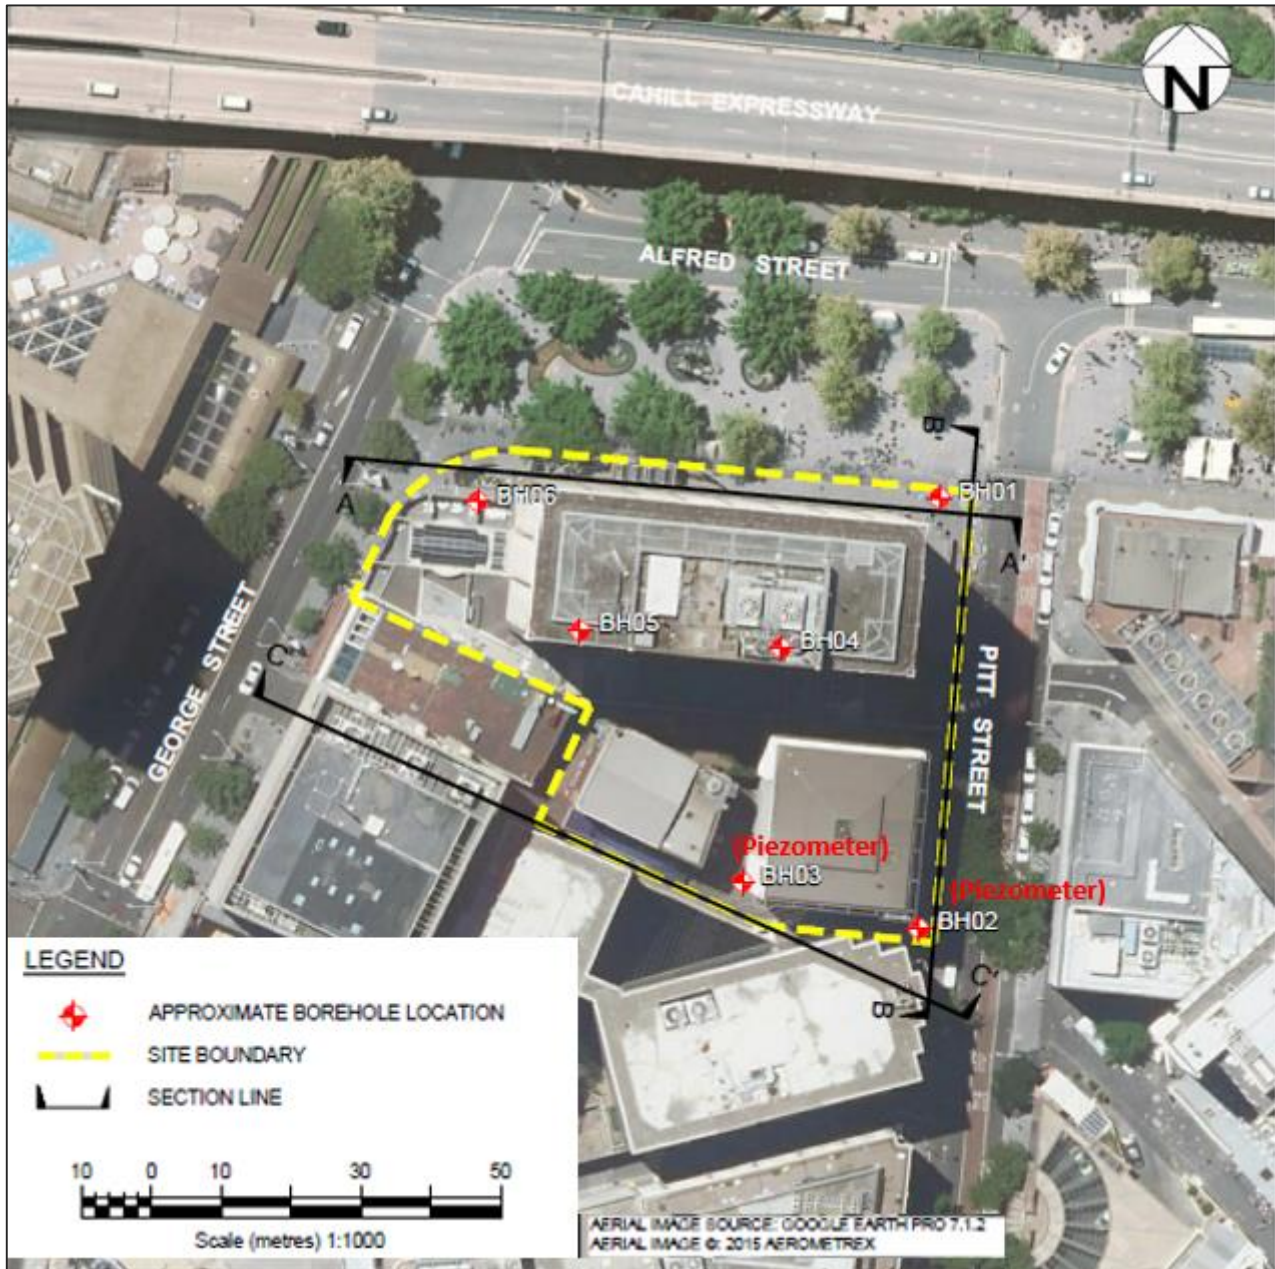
Site plan (sourced from Coffey Report GEOTLCOV24001AF-AB)
